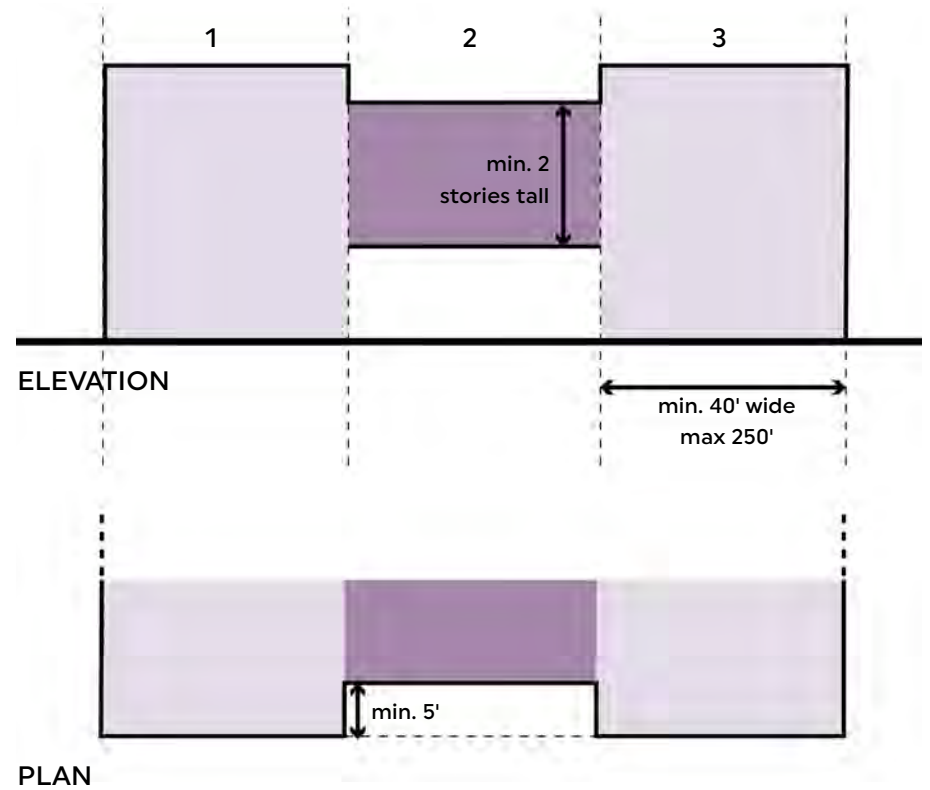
Elevation and plan of subdividing the mid-rise; here illustrating minimum subdivisions for facades longer than 250 feet
